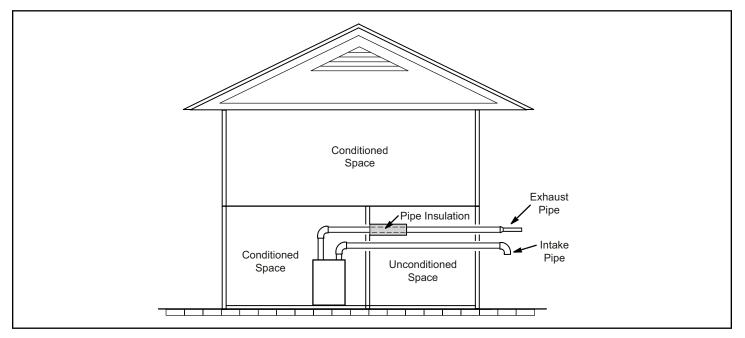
Insulating Exhaust Pipe in an Unconditioned Space
